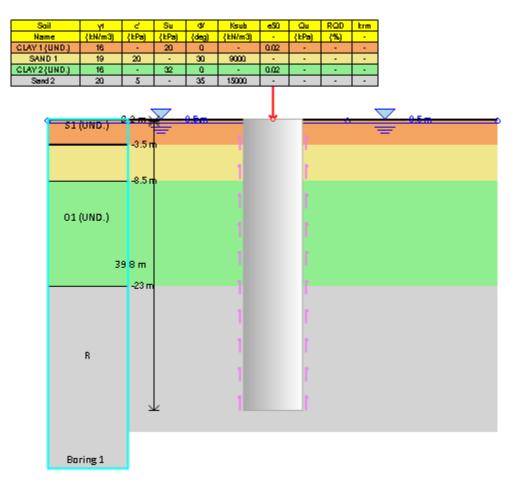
Assembly of pile foundation, Case study "5" Alcacer do Sol (1979)
